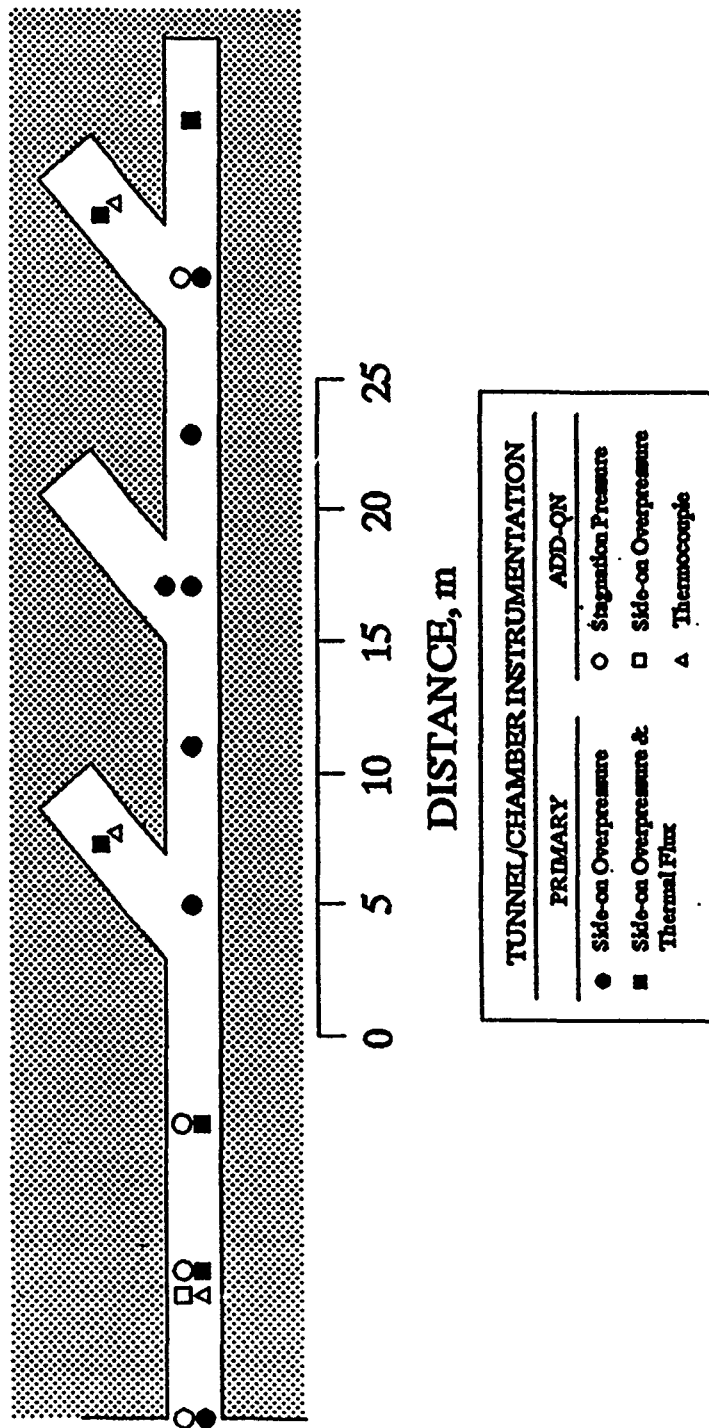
Interior transducer locations for 1/3-Scale Camp Stanley Underground Munitions Storage Concept Validation Test.
